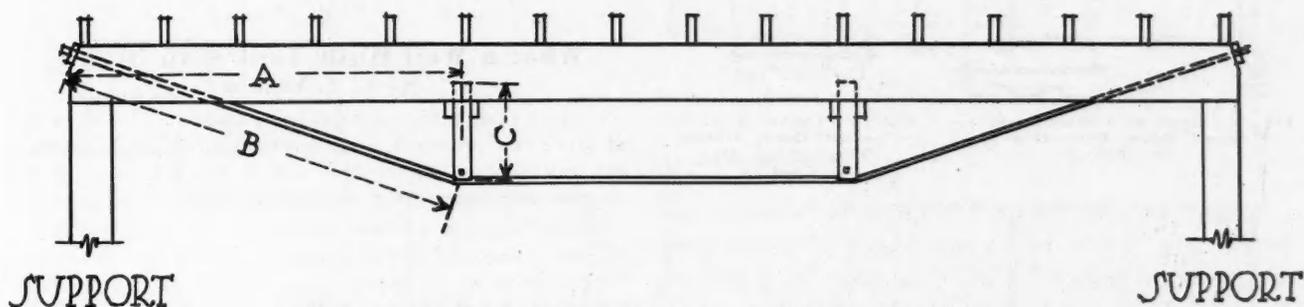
Trussed Beam with Two Struts Located at the One-Third Points.
